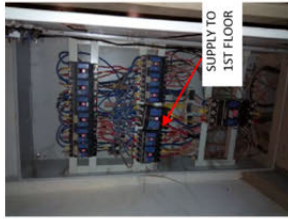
SUB MAIN DISTRIBUTION BOARD. (Inside Equipment Room-Ground floor)
